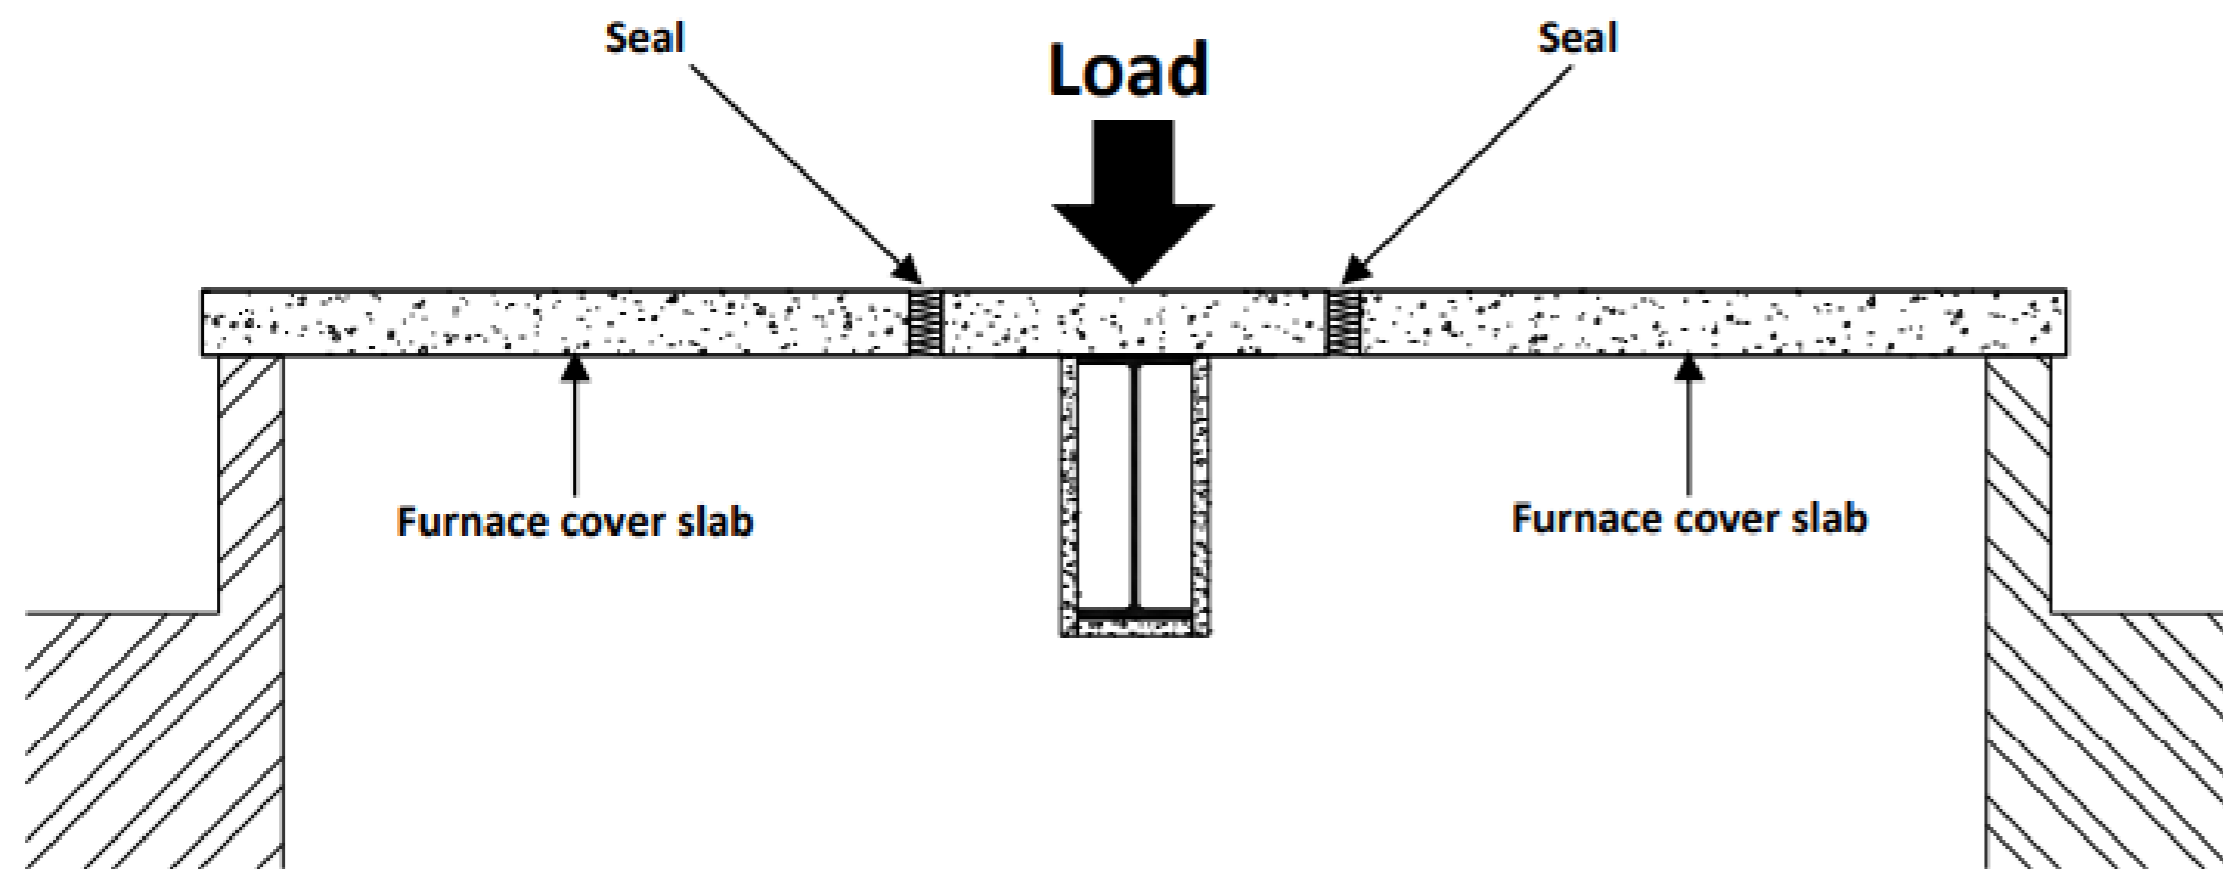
General arrangement for fire tests on beams (in this instance protected with a board)
